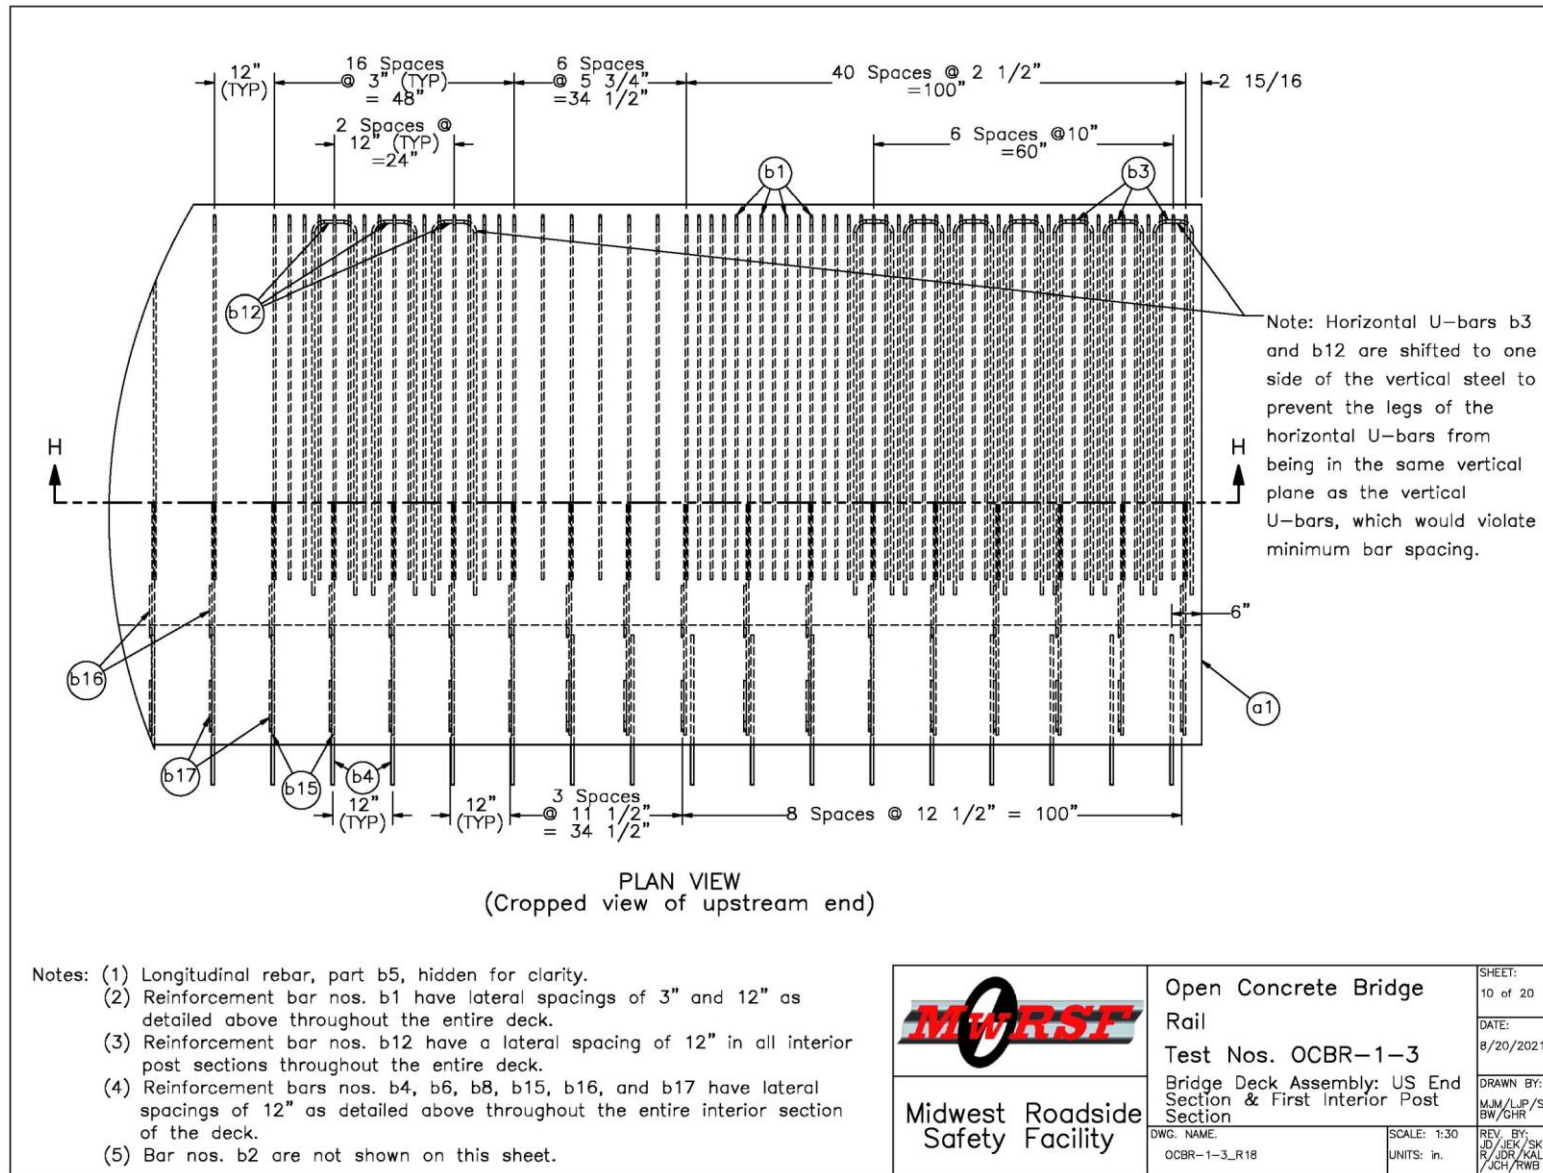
Bridge Deck Assembly: Upstream End Section and First Interior Post Section, Test Nos. OCBR-1, OCBR-2, and OCBR-3
